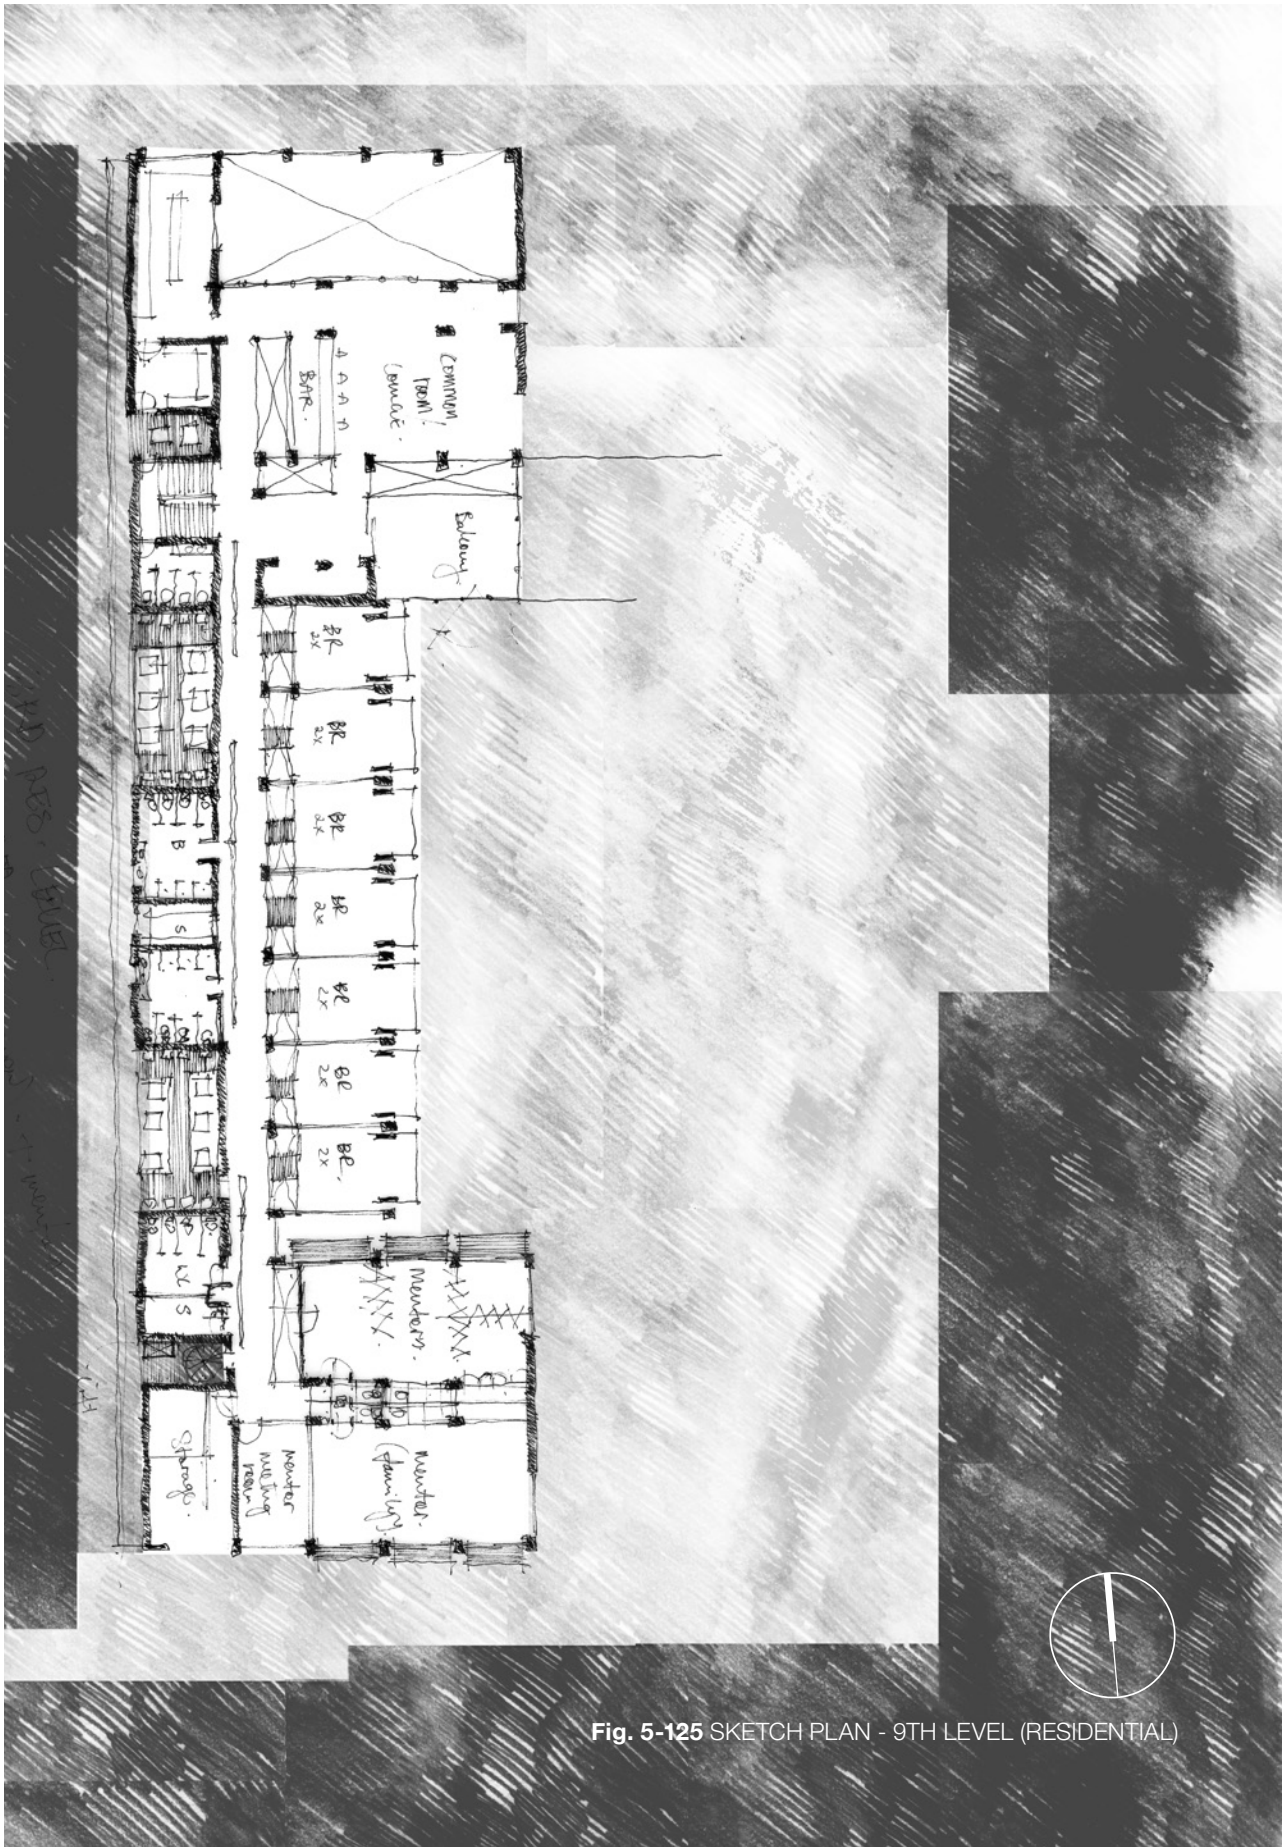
SKETCH PLAN - 9TH LEVEL (RESIDENTIAL)
